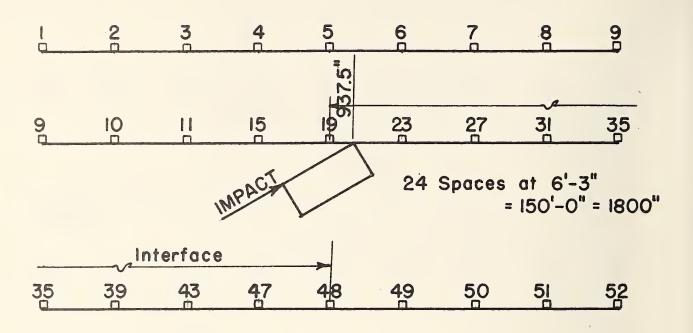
GUARDRAIL TYPES A AND C CONFIGURATION
